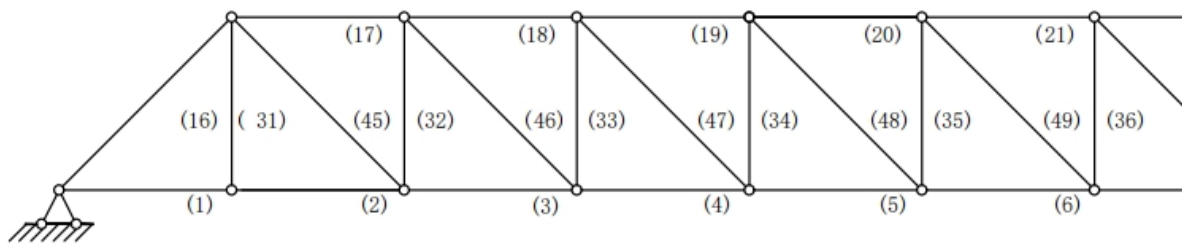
Part of the Pratt Truss Bridge Scheme 1 model
